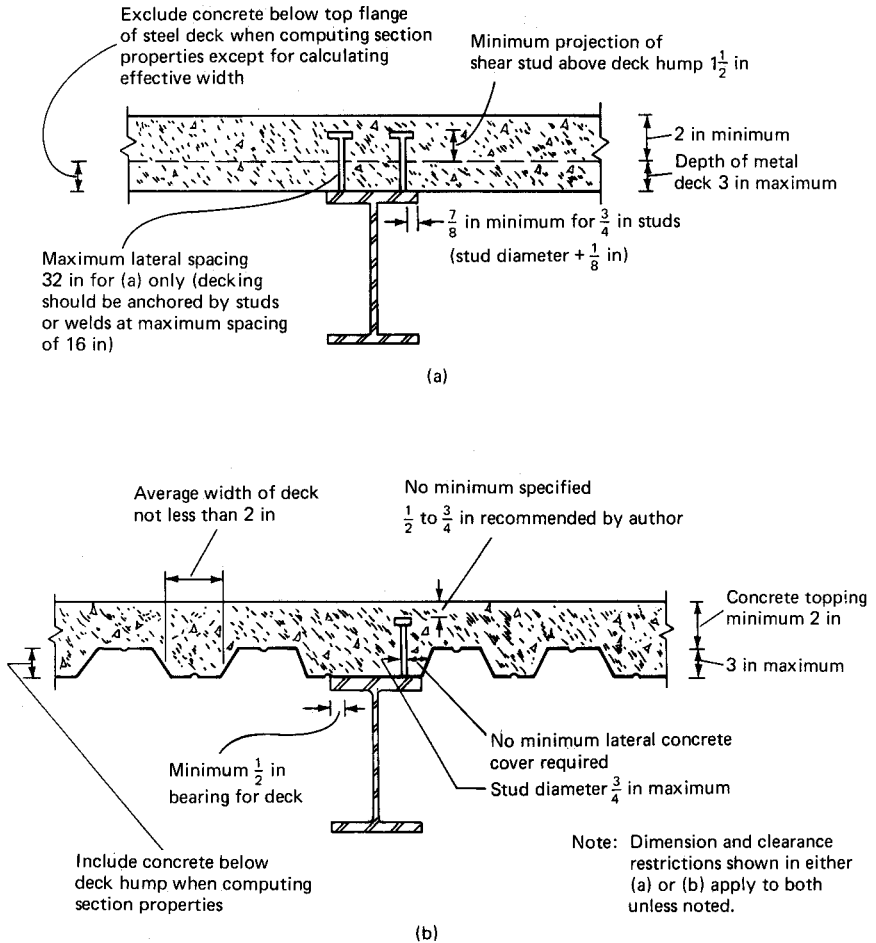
Composite beam with formed steel decking showing AISC requirements. (a) Deck perpendicular to beam; (b) deck parallel to beam.
